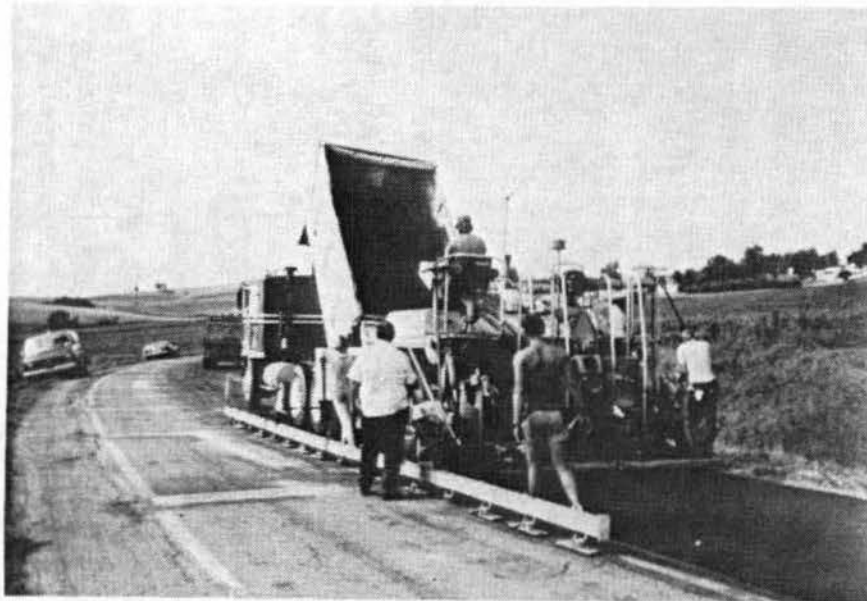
Placement of 38 mm (1.5 in.) Asphalt Concrete Lift
